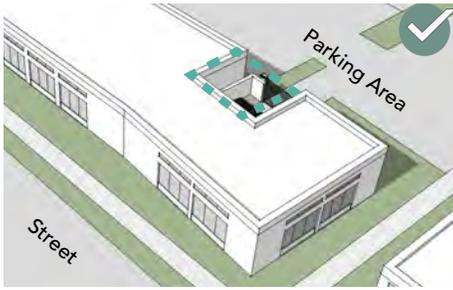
Locate a utility or service area to minimize visual impacts to the street and sidewalk.
